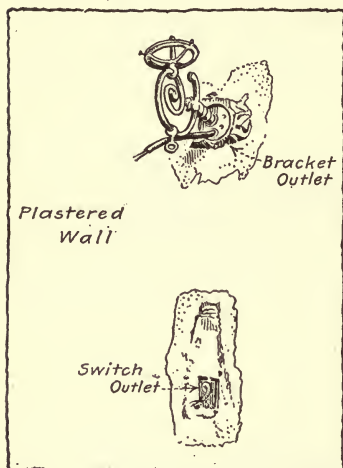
Switch and bracket outlet on hall lamp circuit.
